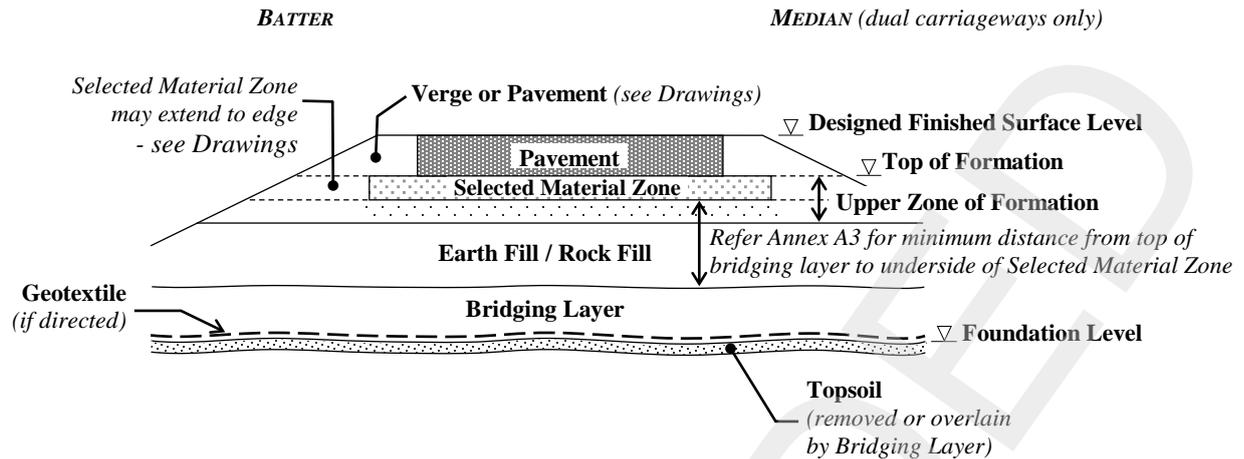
(b) – Embankment Foundation Treatment Type E2 – Bridging Layer
